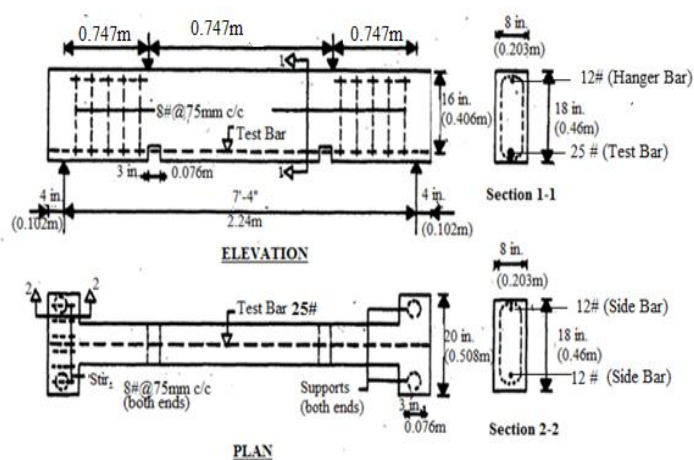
Reinforcement details of beam specimen (NBS beam)
